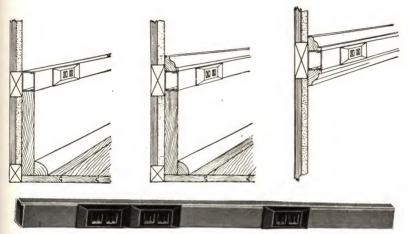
Upper Left, Plugmold on Top of Baseboard without Molding. Upper Center, Plugmold on Top of Baseboard with Molding. Upper Right, Plugmold Mounted at Chair-Rail Height.
